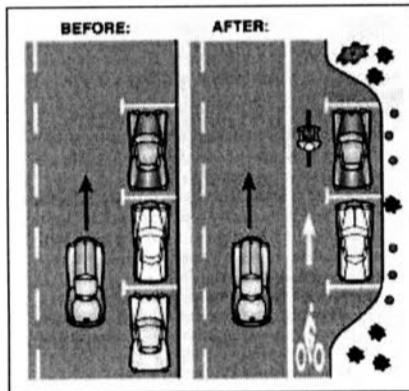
Example of retrofitting street to accommodate bike lanes and on-street parking
